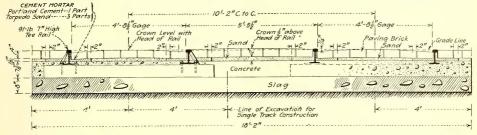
CHICAGO STANDARD TRACK TYPE NO. 4: SLAG FOUNDATION WITH WOOD TIES IMBEDDED IN CONCRETE
